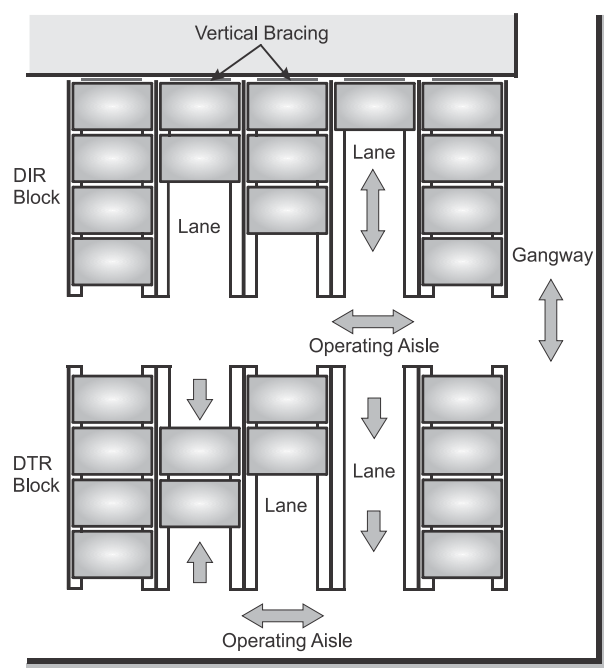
Layout of a Drive-In / Drive-Through Rack
